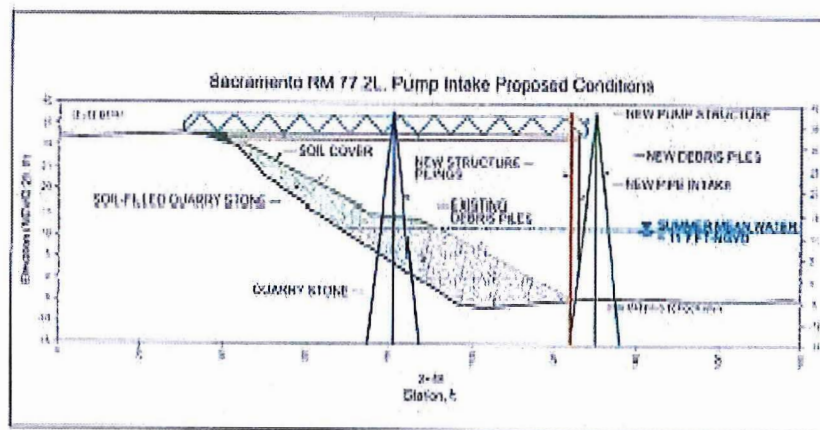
Proposed conditions cross section at SAC RM 77.2L at the pump structure location.
